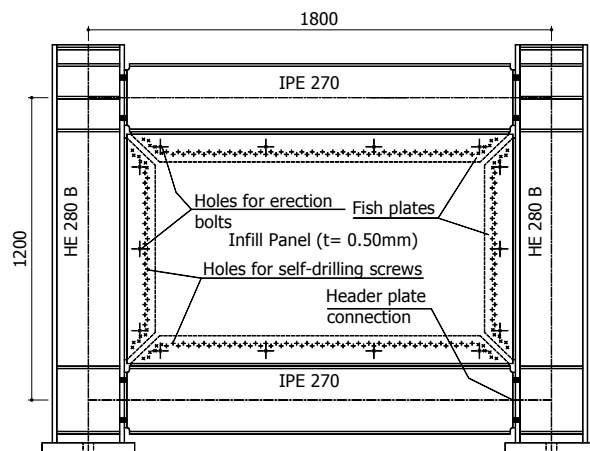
Details of specimen SW-A-H (Dimensions in mm)
